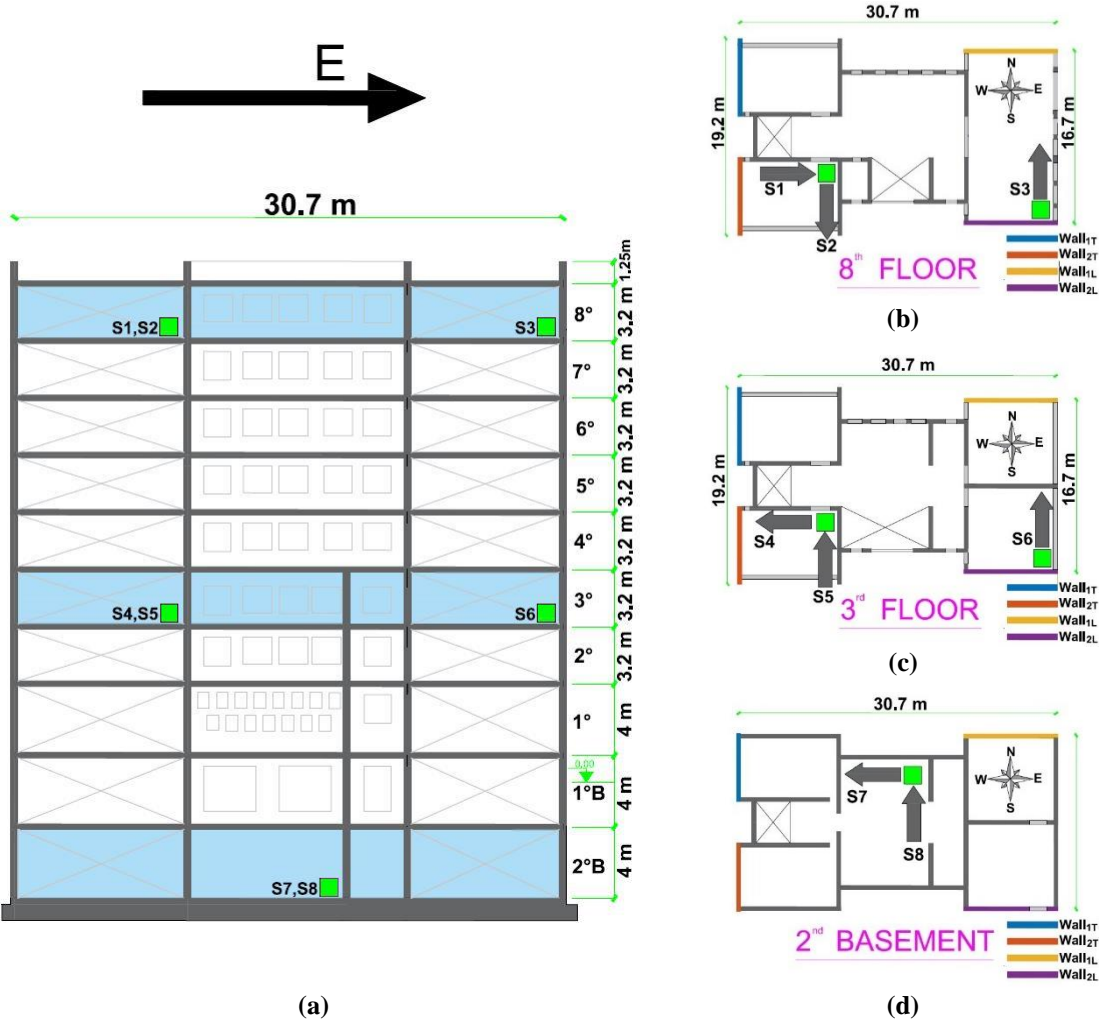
(a) Accelerometers locations, elevation view along the longitudinal direction, (b) sensors installed on the 8th story, (c) accelerometers installed on the 3rd story, (d) sensors installed on the 2nd basement
